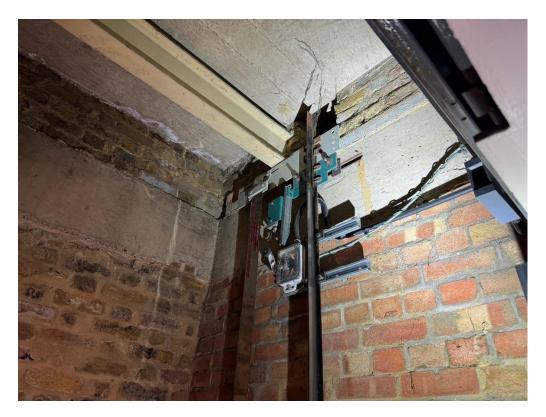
Picture inside lift shaft showing in-situ reinforced concrete cap spanning between masonry walls
